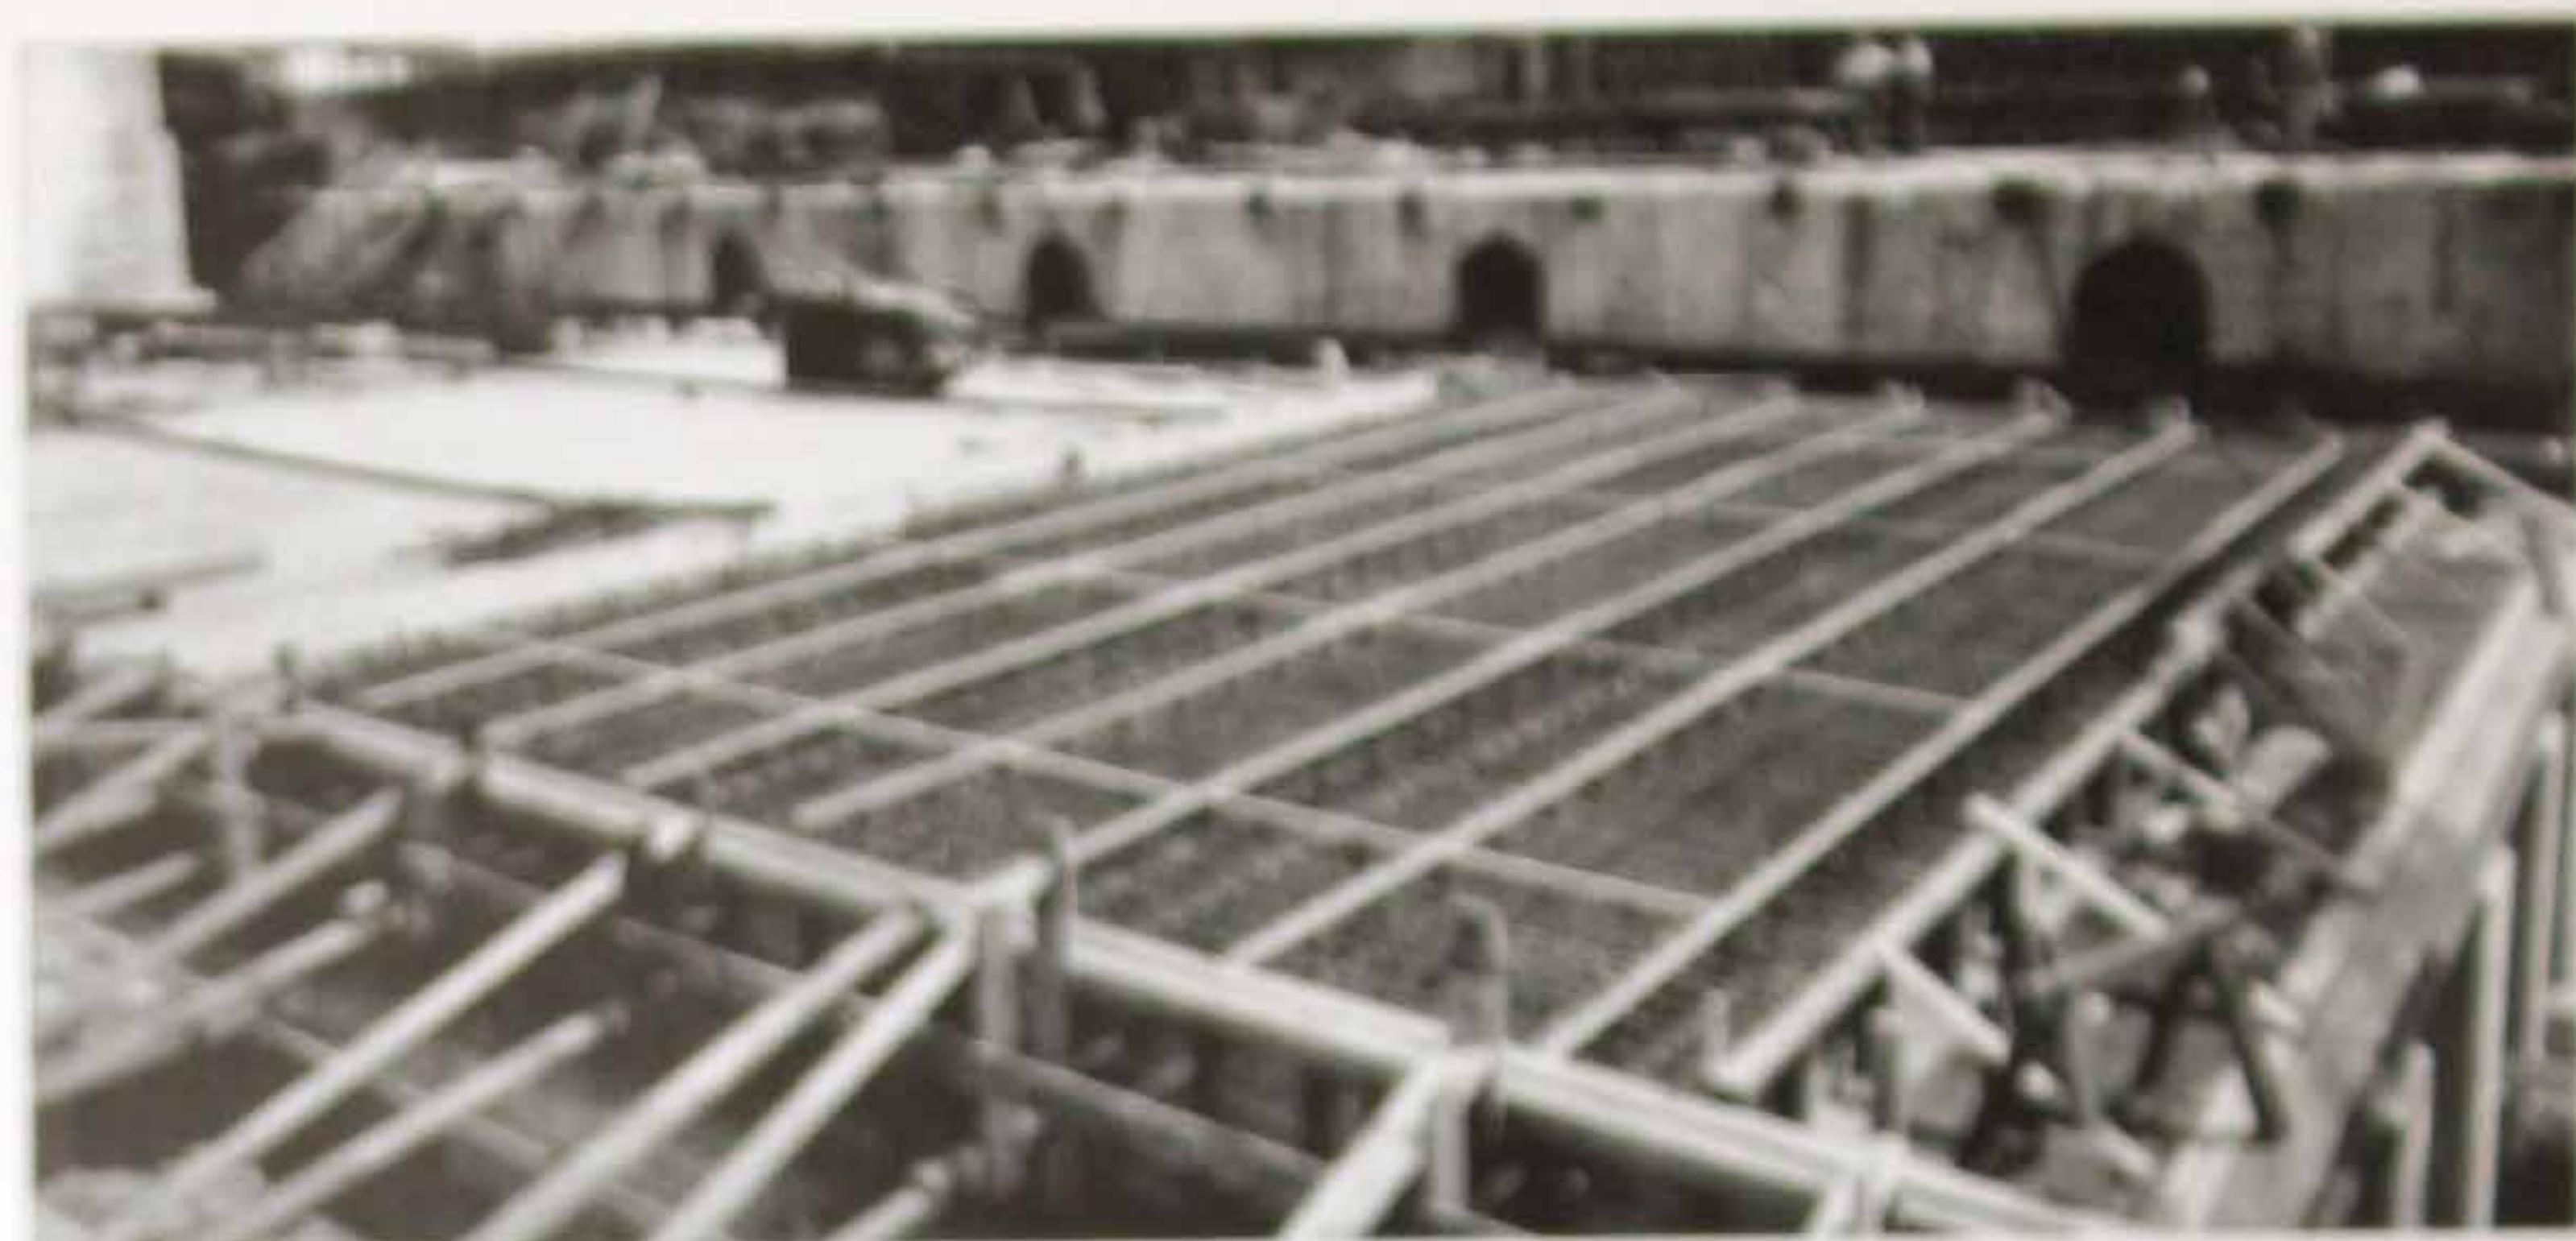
Example of the method of reinforcing somewhat similar to that shown in the left vertical wall of furnace shown in Fig. 14.
